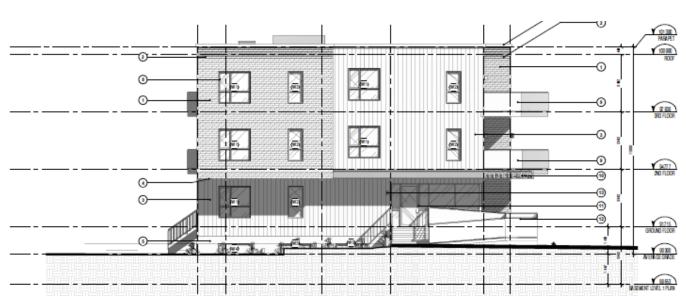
West elevation drawing of the proposed low-rise apartment building at 1131 Teron Road
